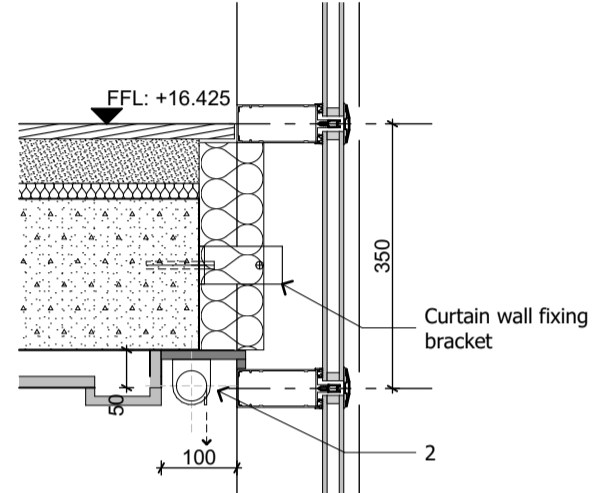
, 1st Flr House Transome B-D CW2, 4, 6, 8
